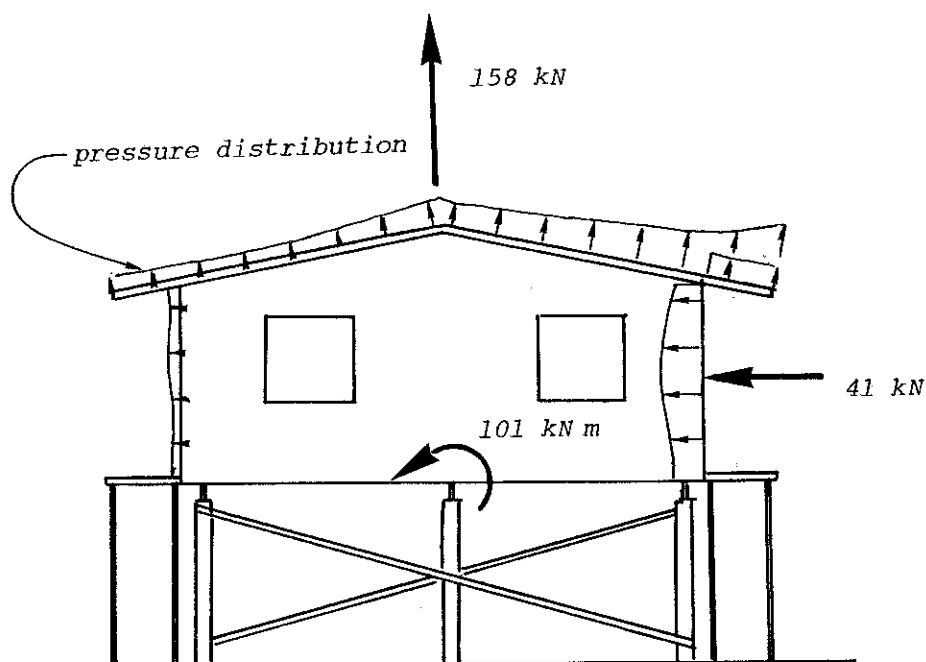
Design Wind Loads on Hyne House from Wind Tunnel Studies.
